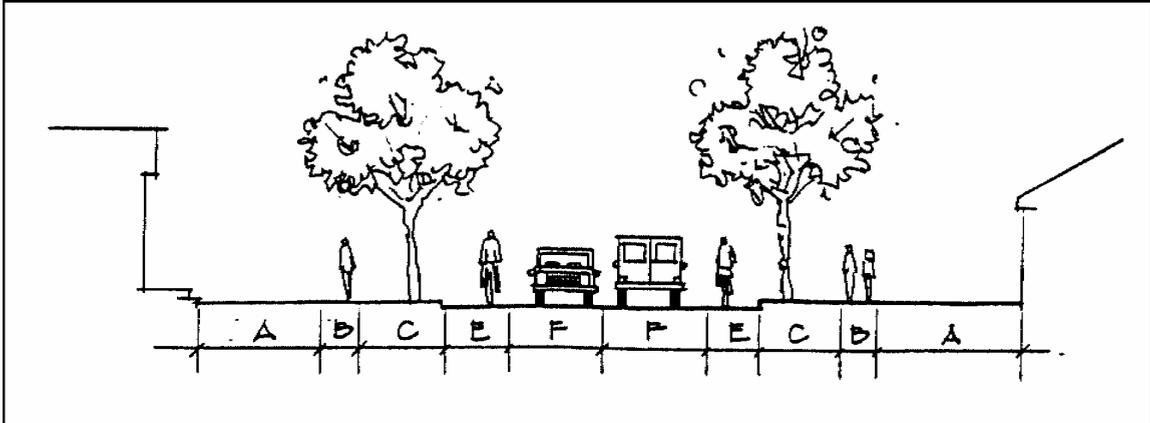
Schematic sketch of a typical sub-collector street cross-section. Table 1 lists the recommended dimensions of each component: A) building setback from street right-of-way; B) walkway; C) planting area; E) bicycle lane; F) travel lane.
